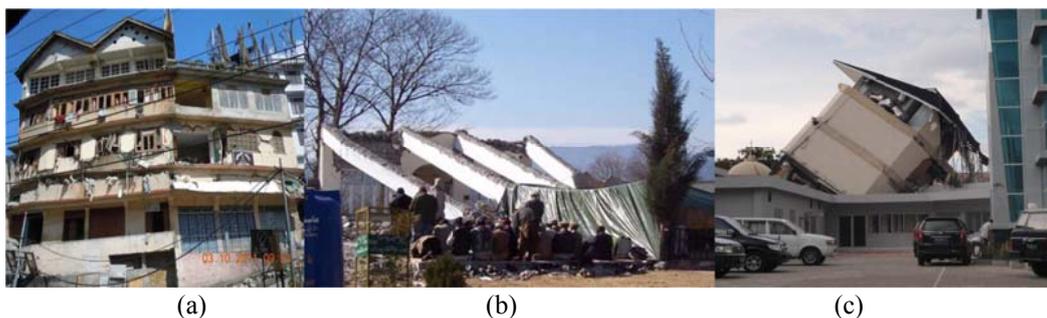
Failure due to strong-beam weak-column mechanism: (a) Pan-caking failure of school-cum-residential building at Chungthang, India (Murthy, 2001); (b) Strong-beams weak-joint and columns, Pakistan; (c) Building collapse due to column failure, Indonesia (Bothara et al., 2010)
